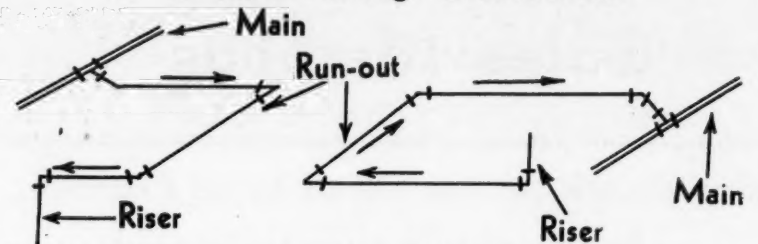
Double-swing connections where both main and riser must be near the wall.
